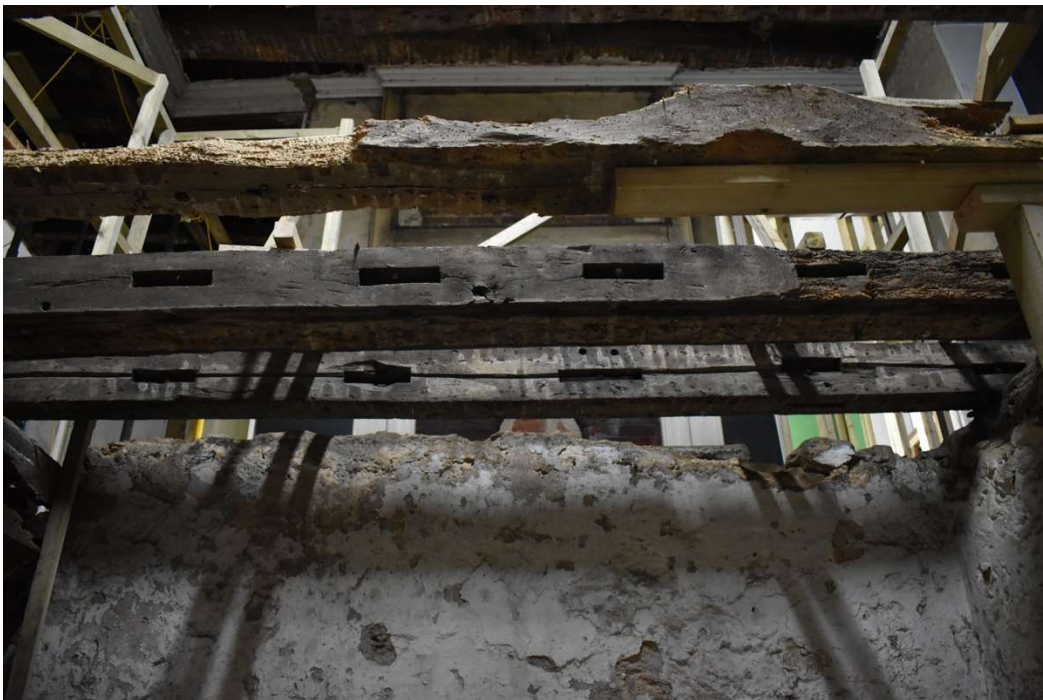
Detail of western arched-brace between bays 3 and 4, showing original corbel, modern replacement binding-beam and 19th-century brick wall subdividing bays, looking southwest.
